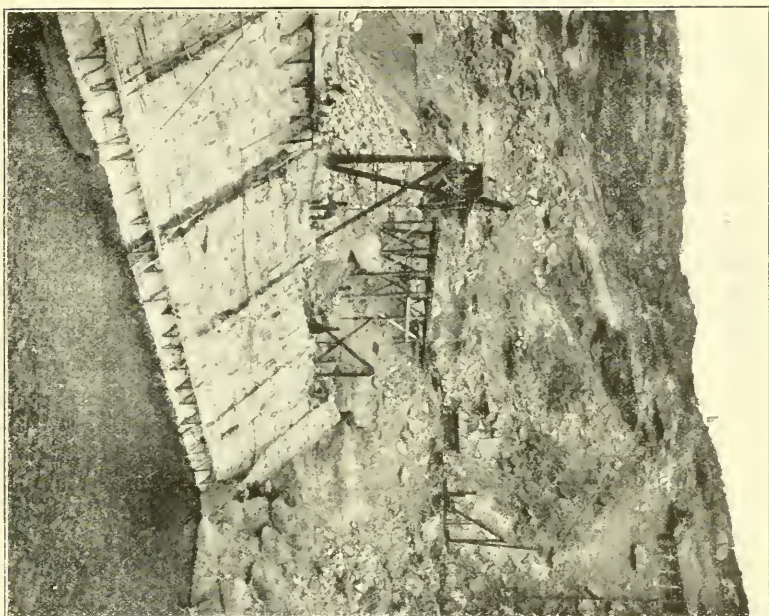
MORENA ROCK FILL DAM, LOOKING NORTHEAST.
